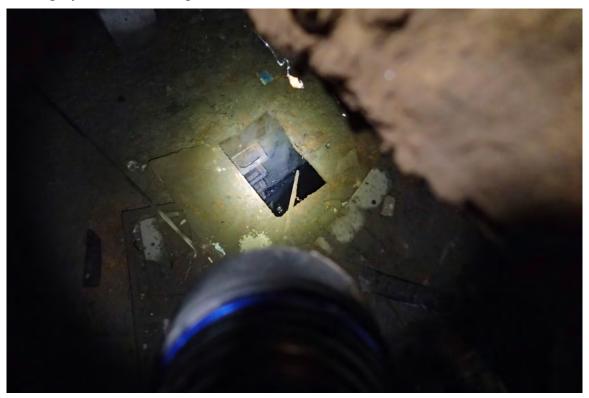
Stoking floor sump access. Photo taken through floor penetration.
